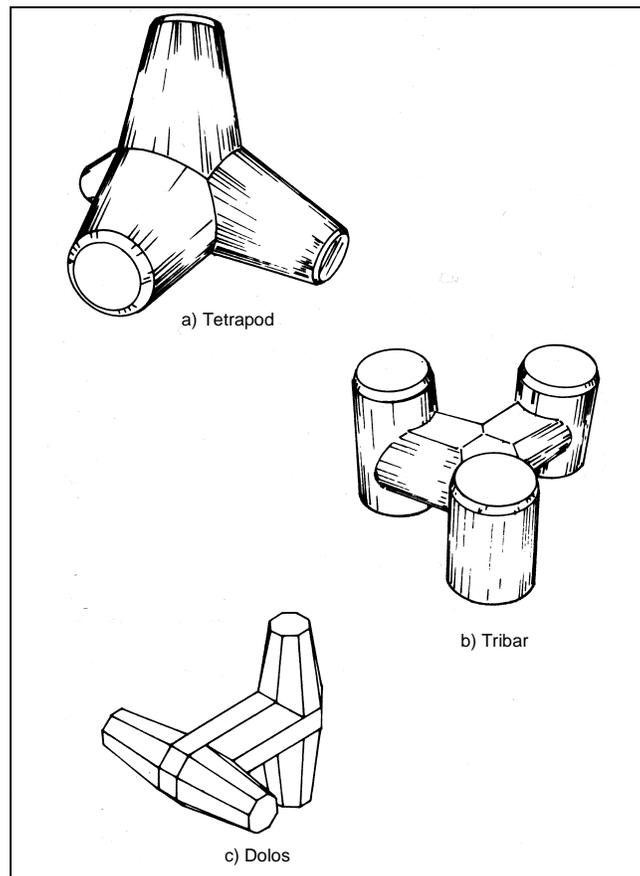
Precast Concrete Armor Units used in Jetties, Breakwaters, and Groins.
